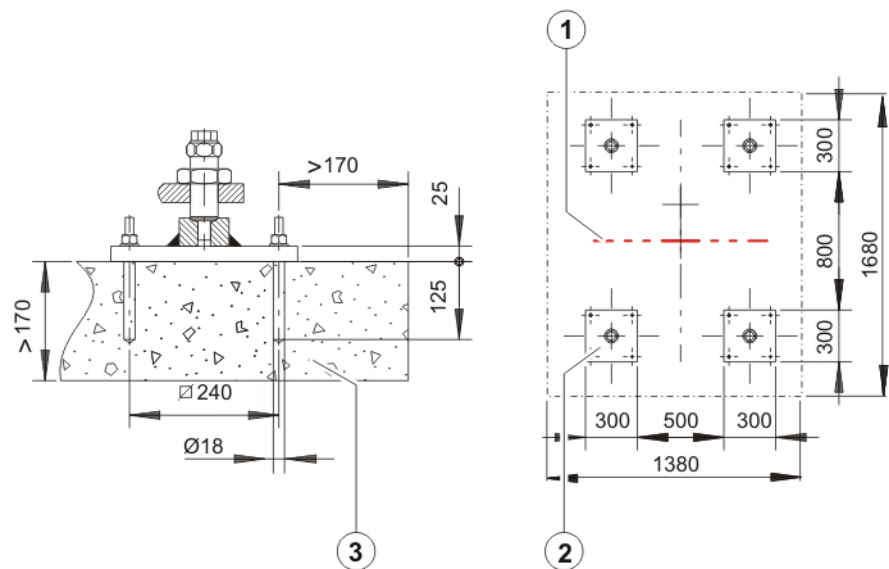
Mounting base with bedplate, dimensioned drawing
